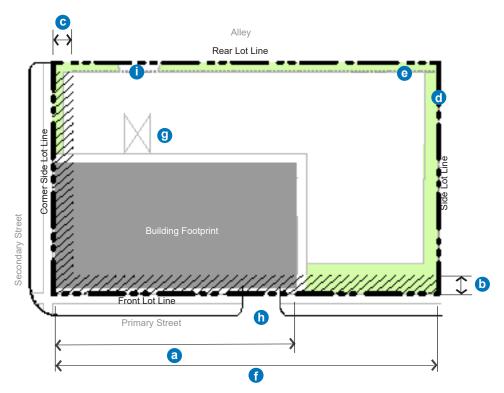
(G)(1). Limited Bay Building: Building Siting.
